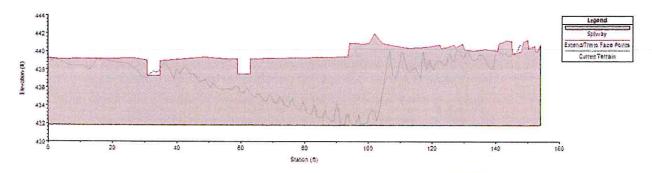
Section view of upstream sheet pile wall with the two fish passage notches shown. The downstream sheet pile wall is similar except it only has a single fish passage notch.
